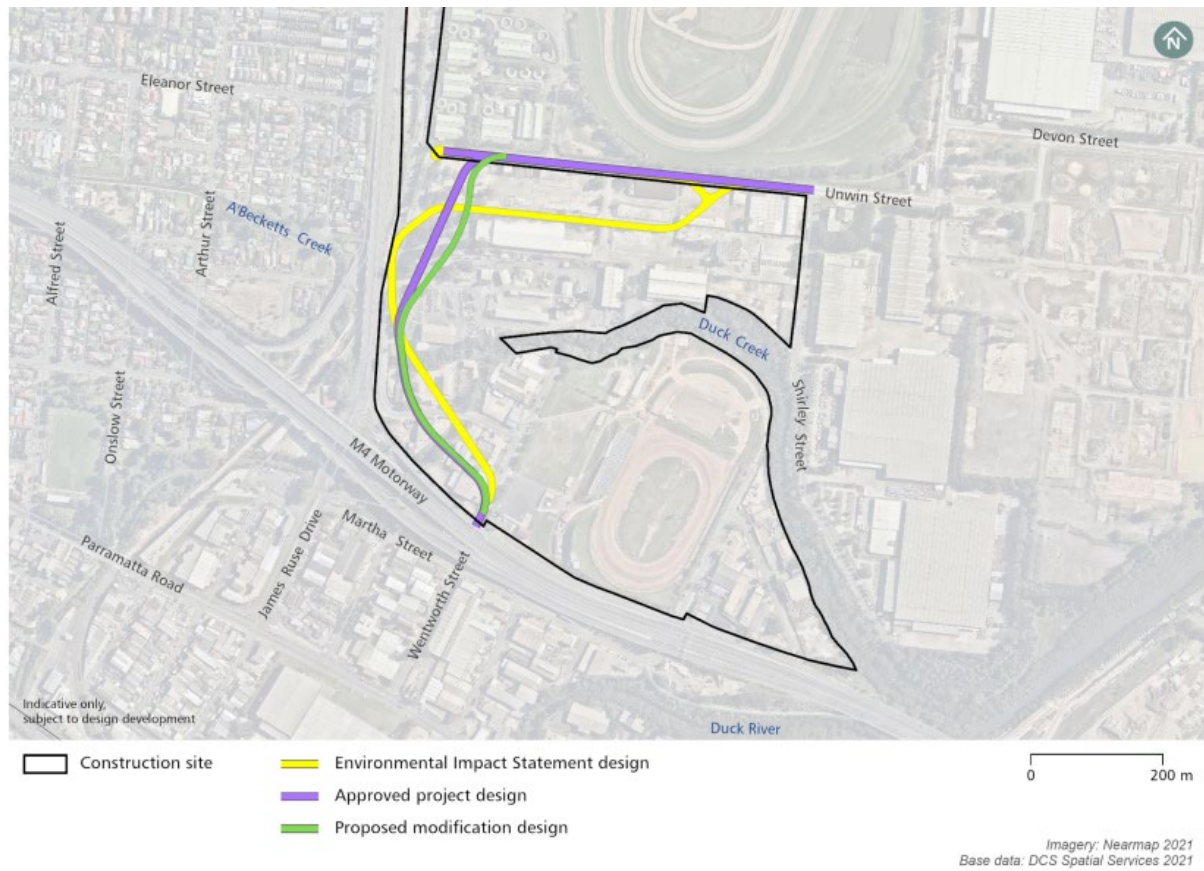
| Proposed modification to Kay Street and Unwin Street in green (Source: Sydney Metro)
